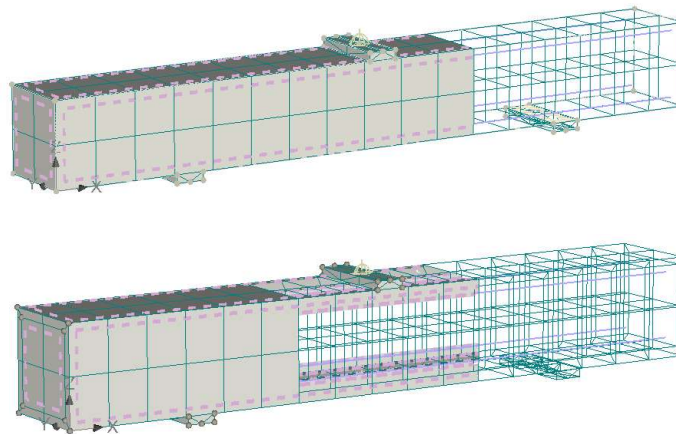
Finite element model of NSC (top) and composite concrete (bottom).
